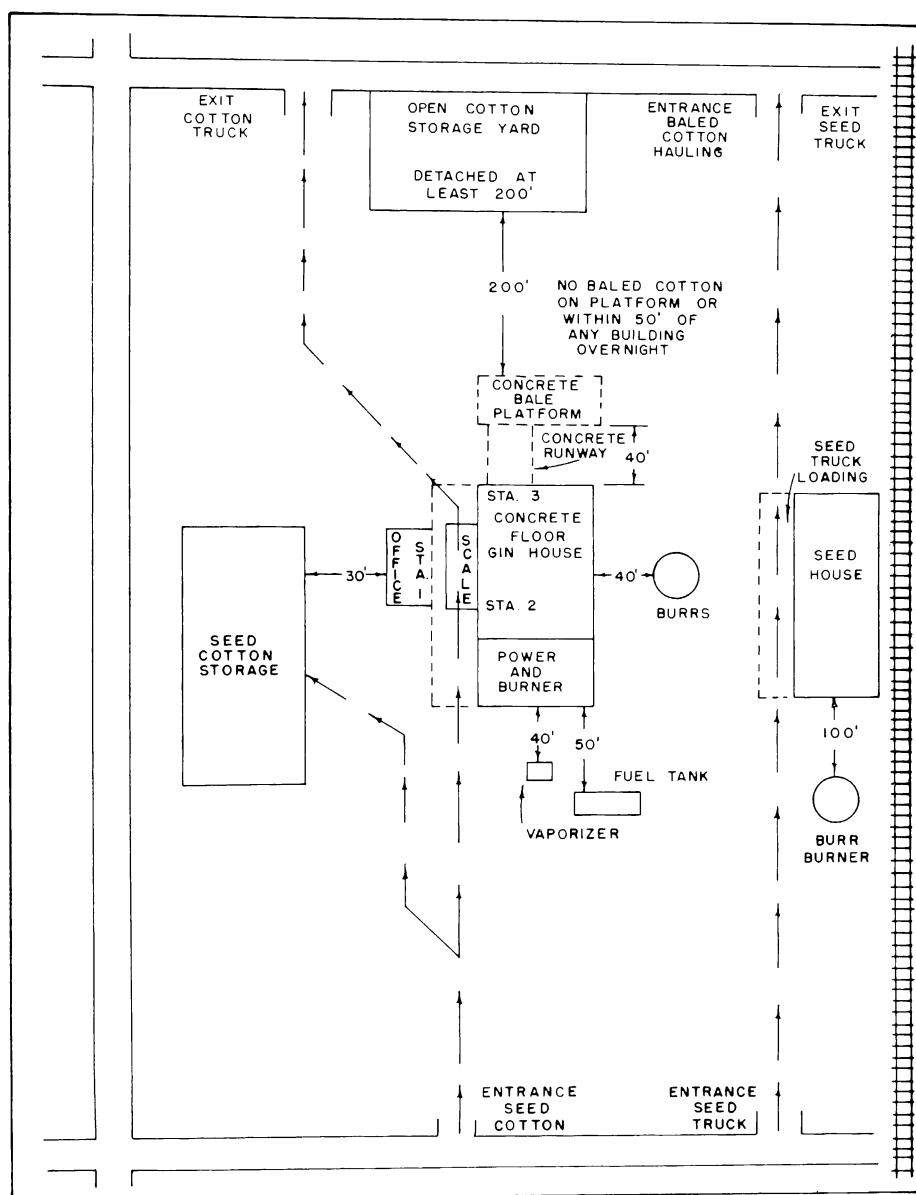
Gin yard design with office scales and gin house combined, and showing minimum safe distances between buildings for protection from fire.
